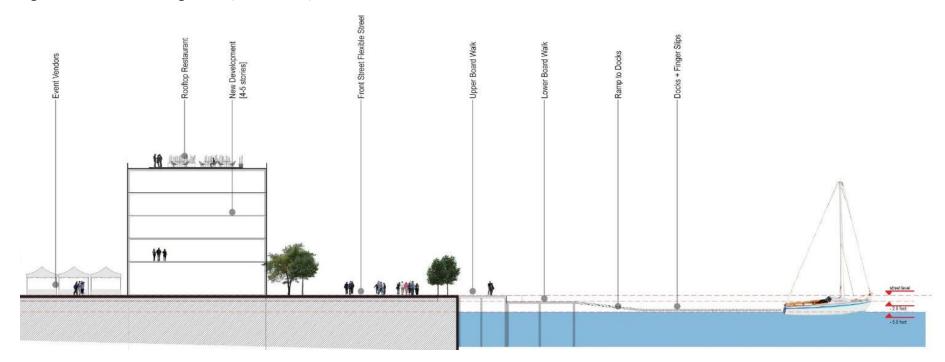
Section through Plaza, Mixed-Use, Front Street and Harbor
